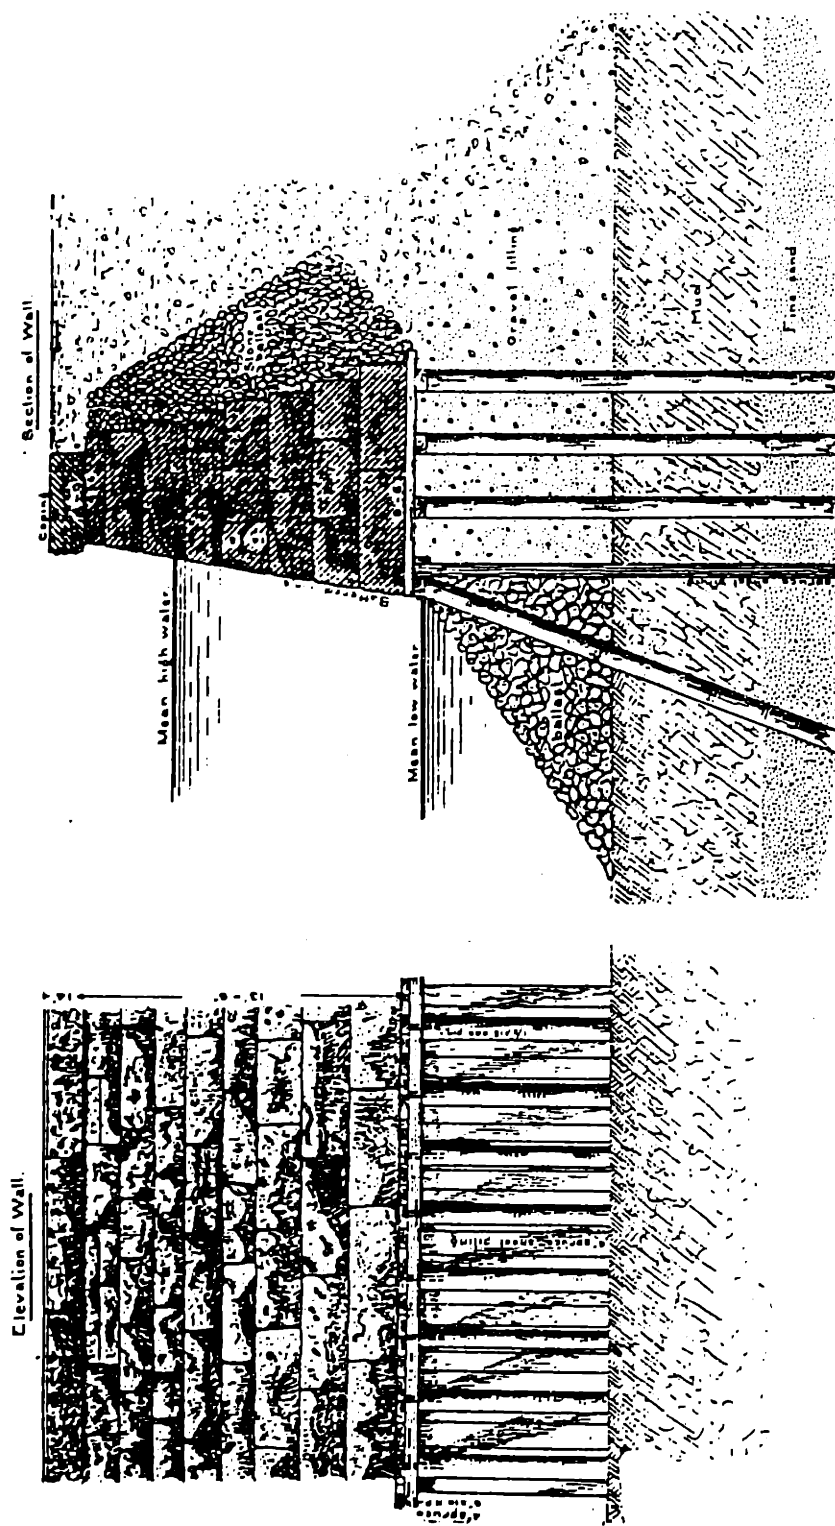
Typical Cross-section of Seawall 'B' (City of Cambridge Park Department, 1895)
